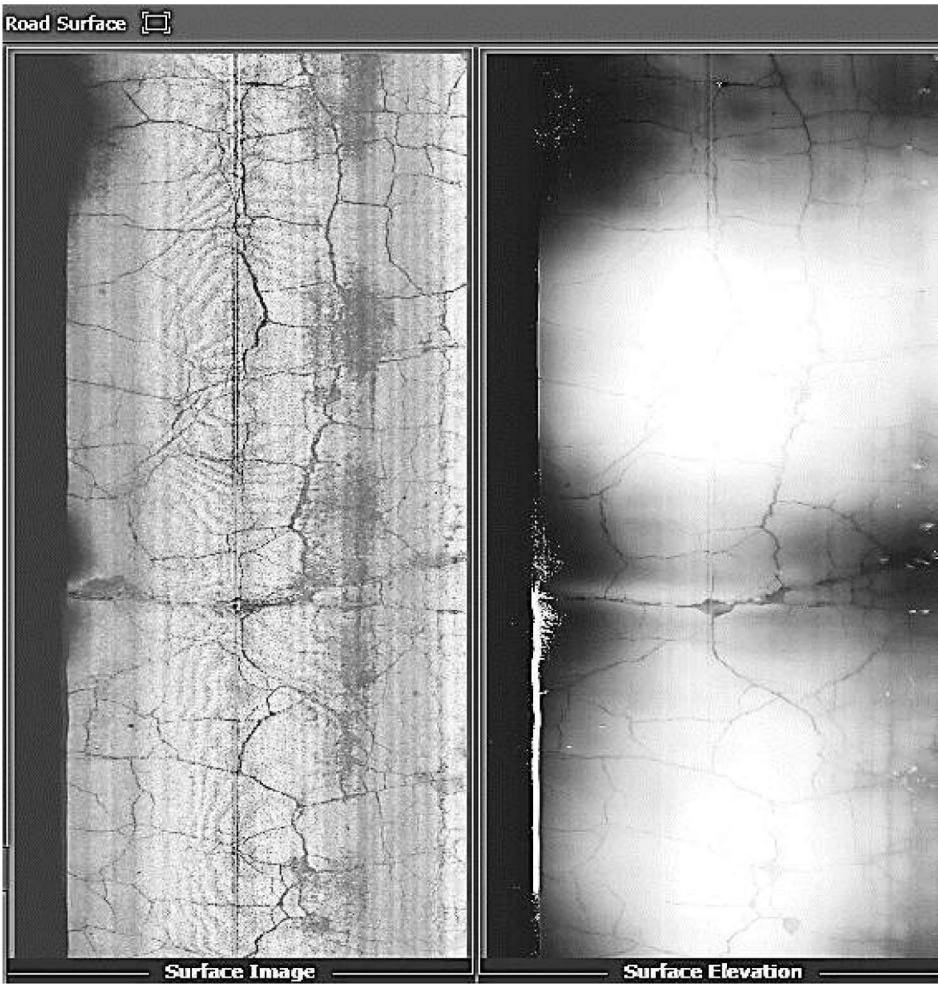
Roadway Imagery of a “Very Poor” HMA Pavement
